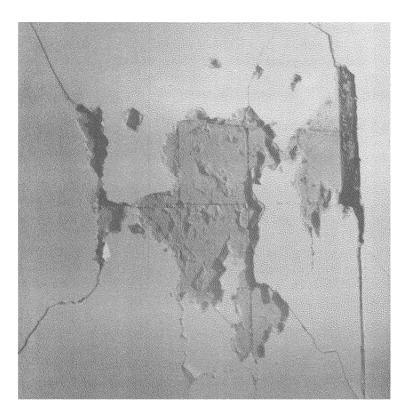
Diagonal cracks in north-south shear wall in first story of Anacapa Residence Hall.
